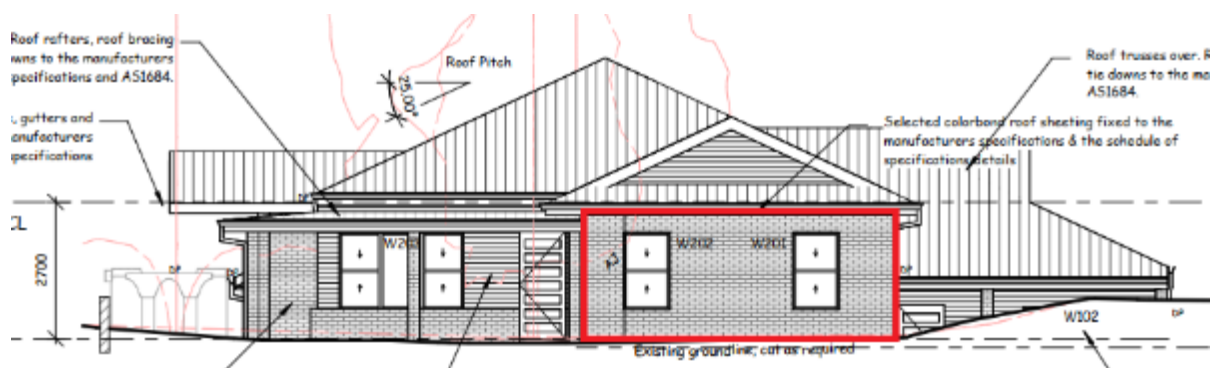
Western front elevation presenting to Cordeaux Street. The red outline is the garage which presents to the southern side boundary. The garage, given it is a side elevation and contains windows will not be perceived as a garage from the streetscape.
